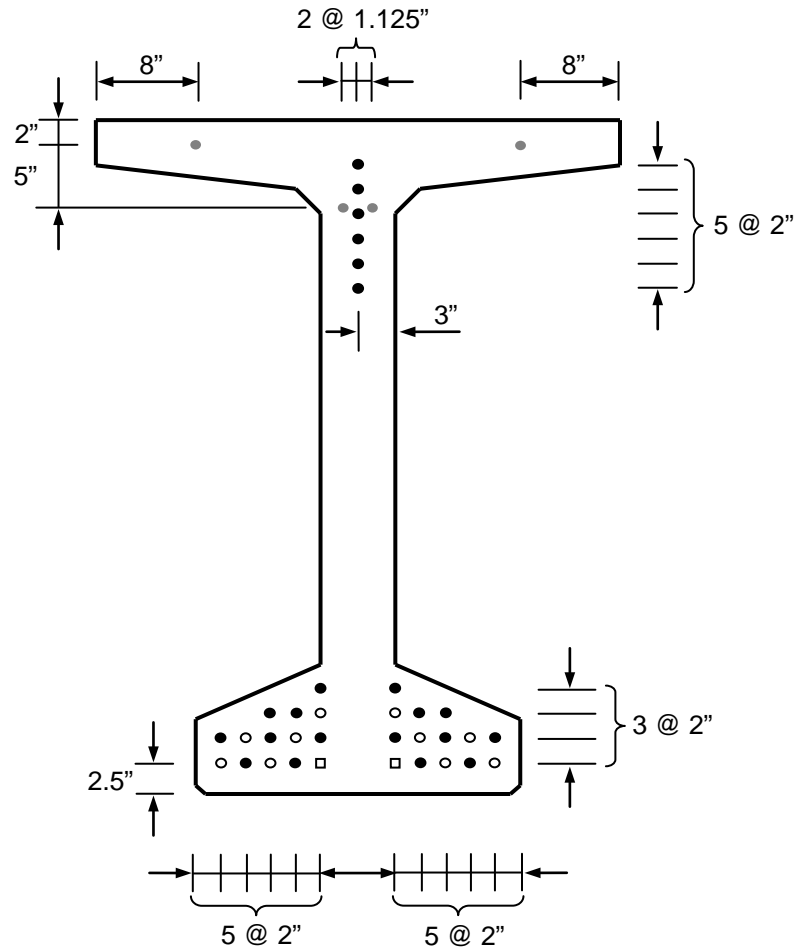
Cross section of a typical BT-54 girder (ALDOT 1988; Swenson 2003)
